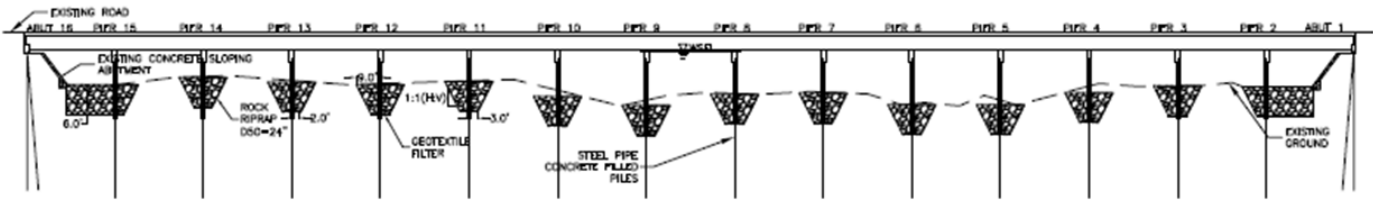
Cross-sectional view of Bridge A-28-O with recommended hydraulic scour countermeasures
